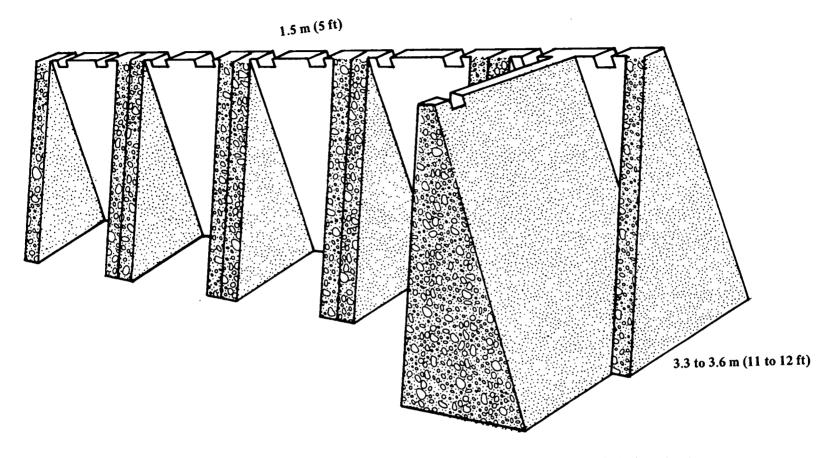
Precast concrete revetment (relocatable 3.35m and 3.66m (11 to 12 ft) high sections).
